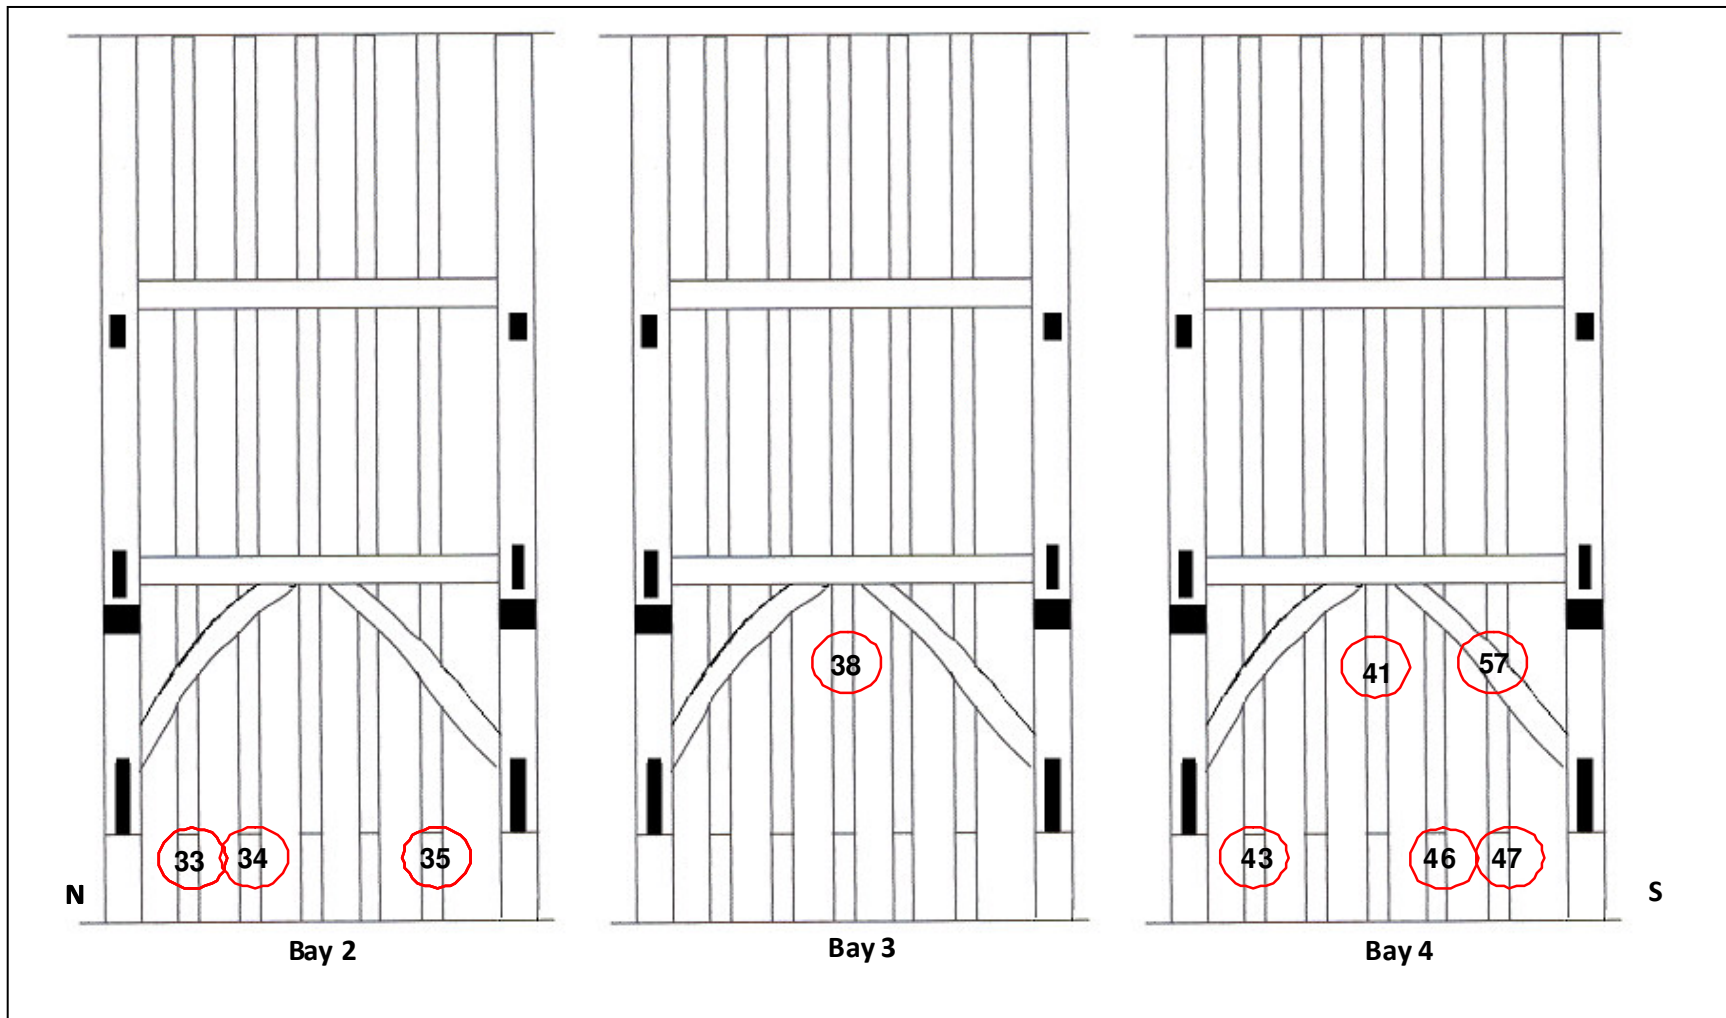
Long-section through north-west transept roof to show sampled timbers (viewed from the west looking east)
